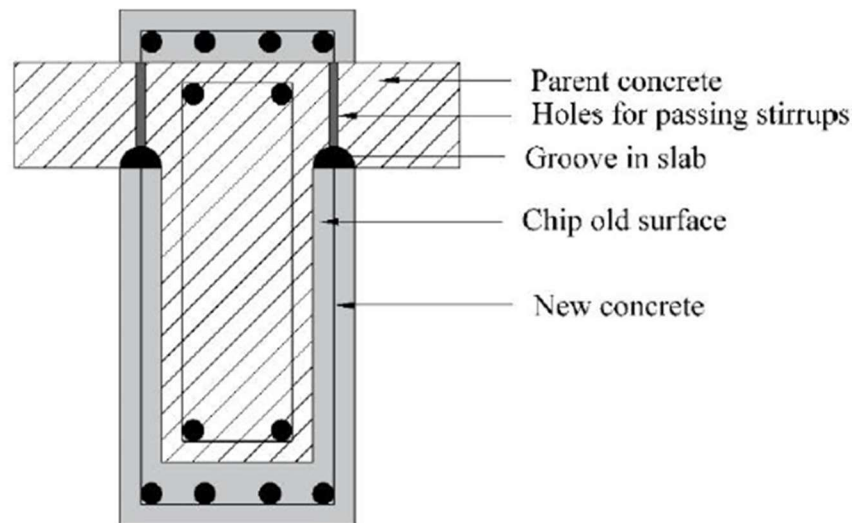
Typical Strengthening by section enlargement/concrete jacketing (Cheong & MacAlevey, 2000)
